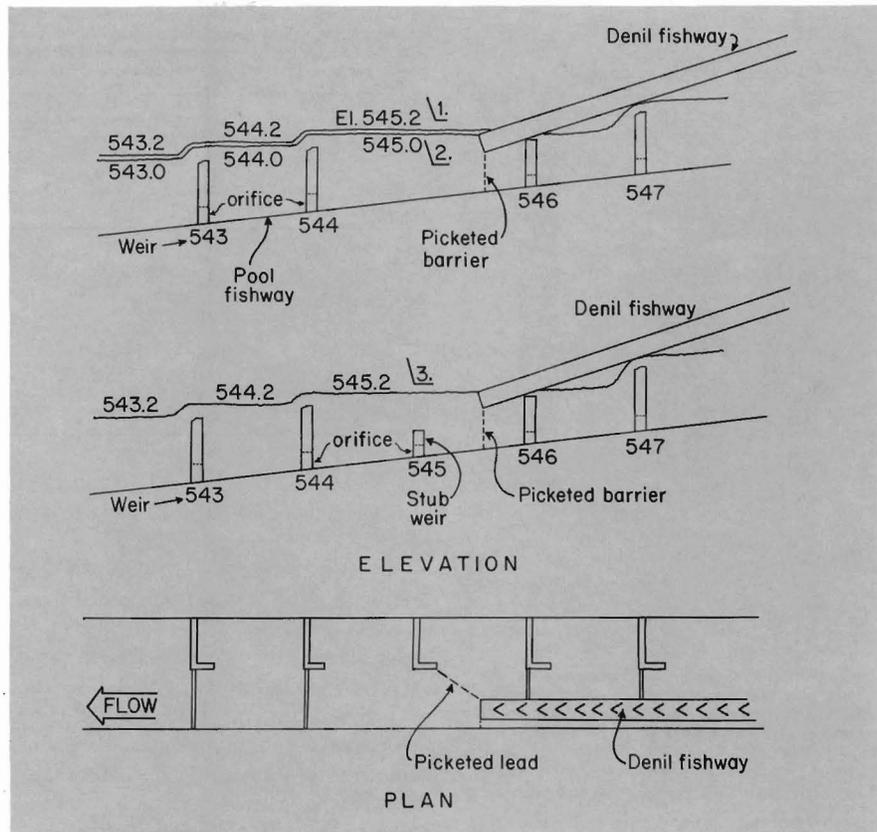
Plan and elevation views of prototype fishway. Plan view illustrates the layout of three test conditions. Elevation view shows the location of the Denil in the pool fishway.
